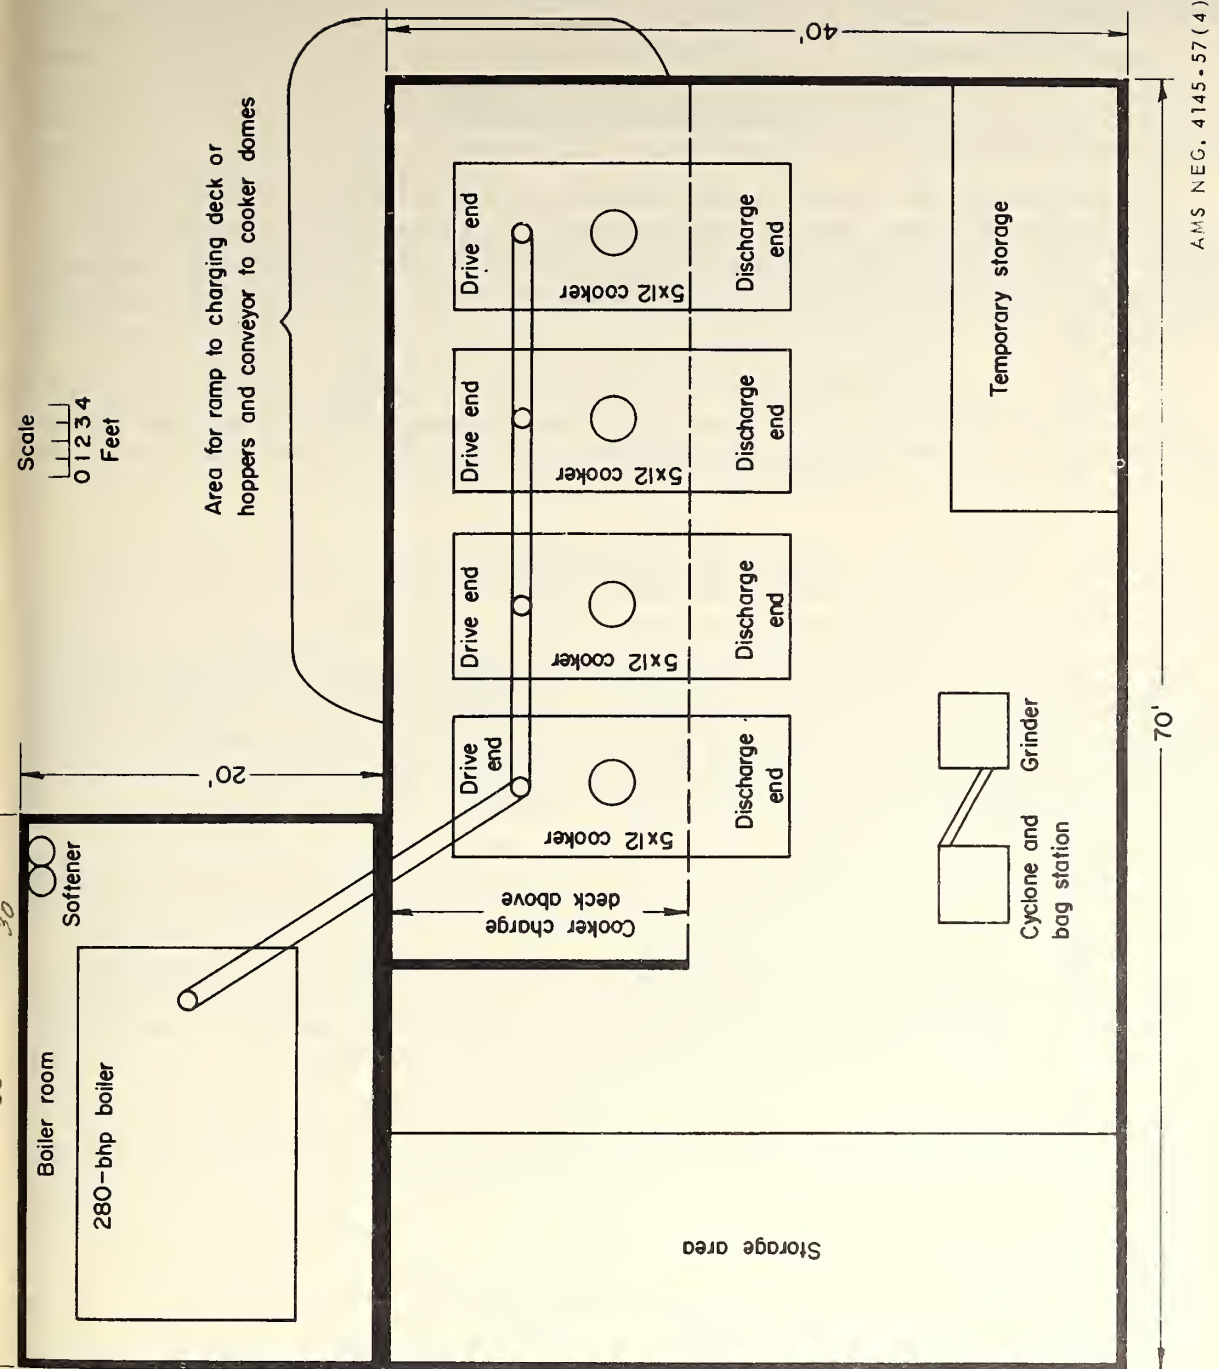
SAMPLE LAYOUT FOR PLANT F
